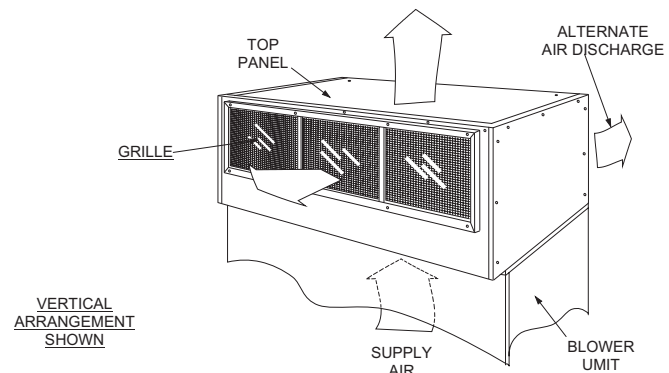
SUPPLY AIR PLENUM ACCESSORY
